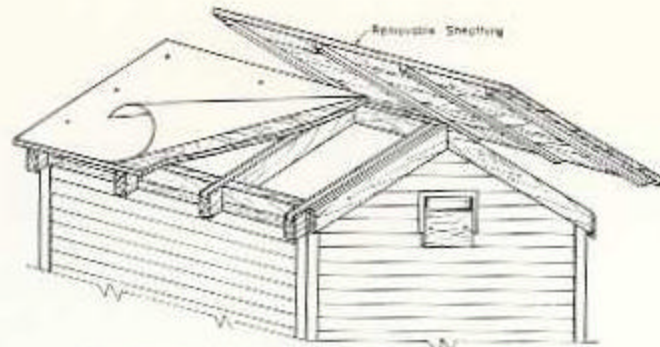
CONSTRUCTION DETAILS OF ATTIC FOR ATTIC VENTILATION TESTS
